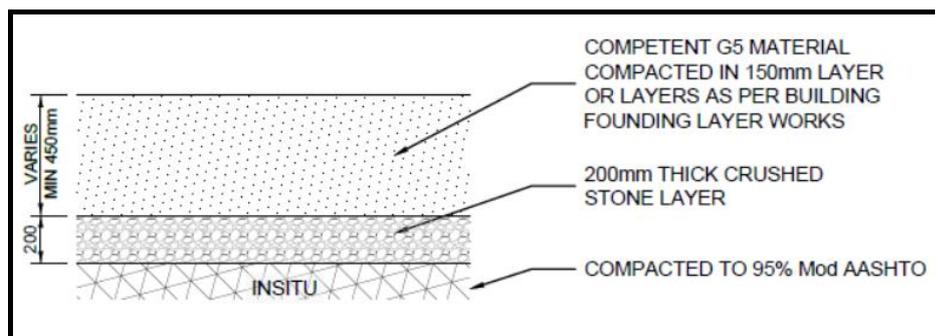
Excavation for road layerworks at depth (source: Walters, 2020)
